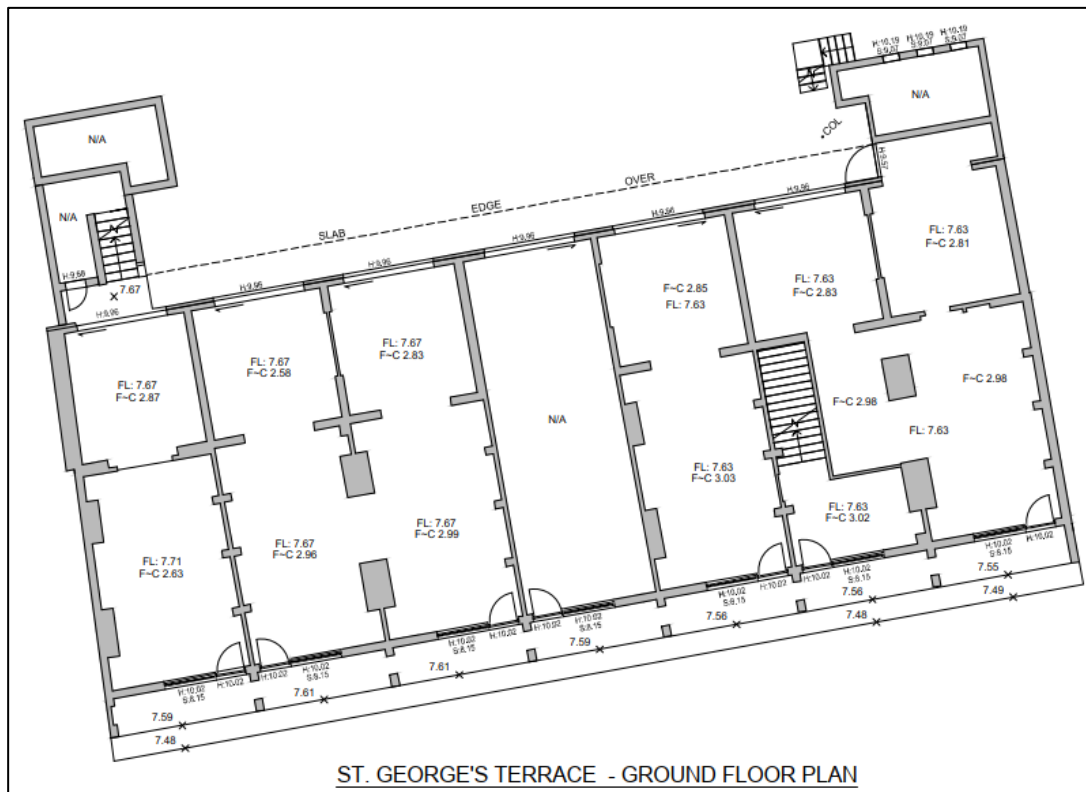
St George's Terrace ground floor plan (Source: LTS Lockley, 2020).
